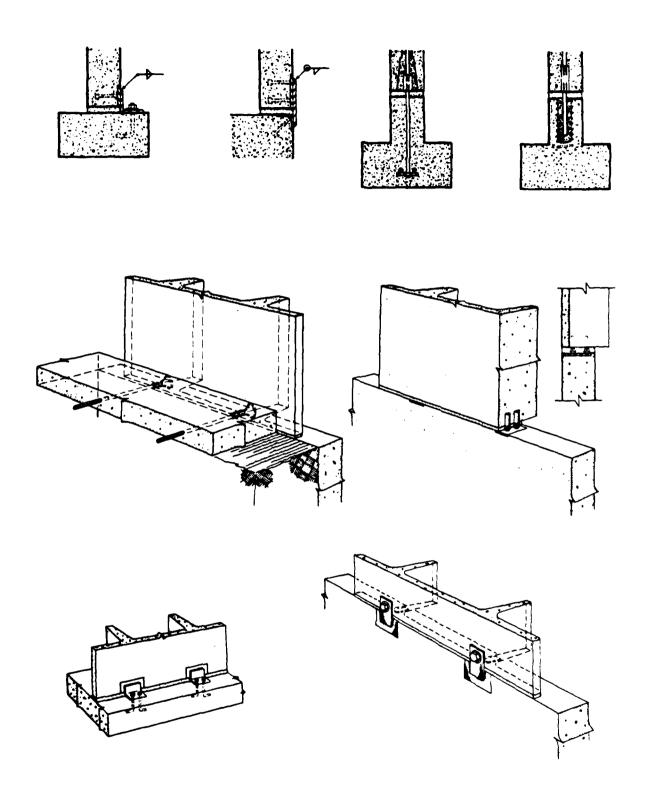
Wall to Foundation Connections (Refs. 17 and 19).
